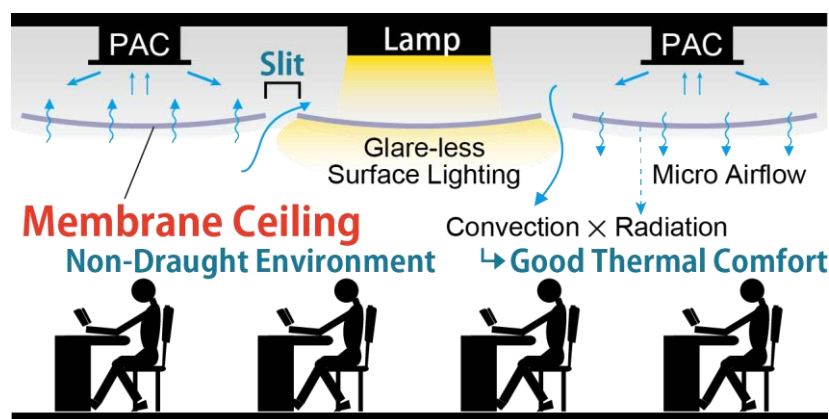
Outline of Divided Membrane Ceiling Air Conditioning System with PAC
